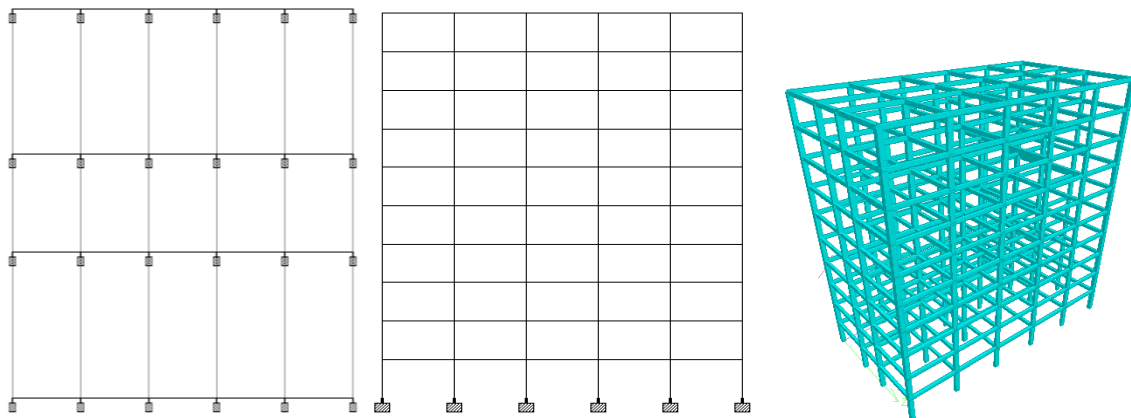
Plan and 3D View of a (G+9) Storey Building Frame Without Shear Walls
